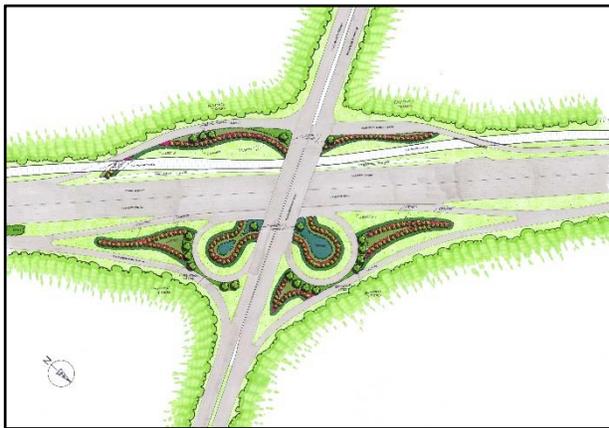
S. Marietta Parkway and I-75 Gateway Improvement Rendering
